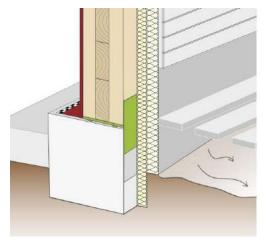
Application of the impermeable barrier between the concrete and the timber structure to prevent the migration of moisture from the concrete to timber wall(s) [14].
